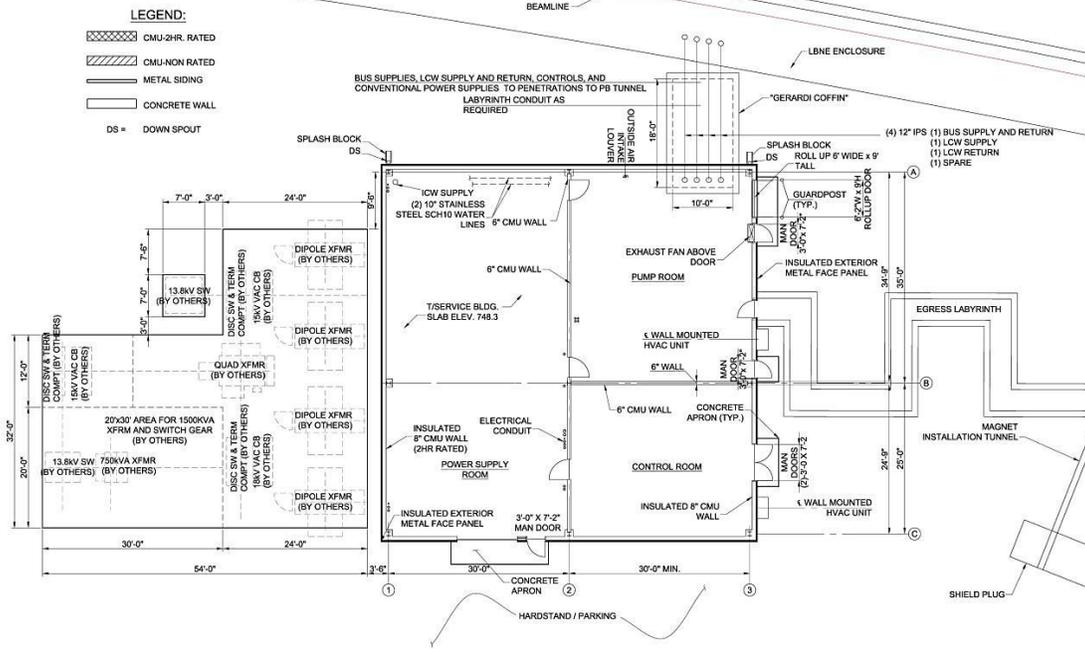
Primary Beam Service Building (LBNE 5) and Exterior Transformer Pad.
